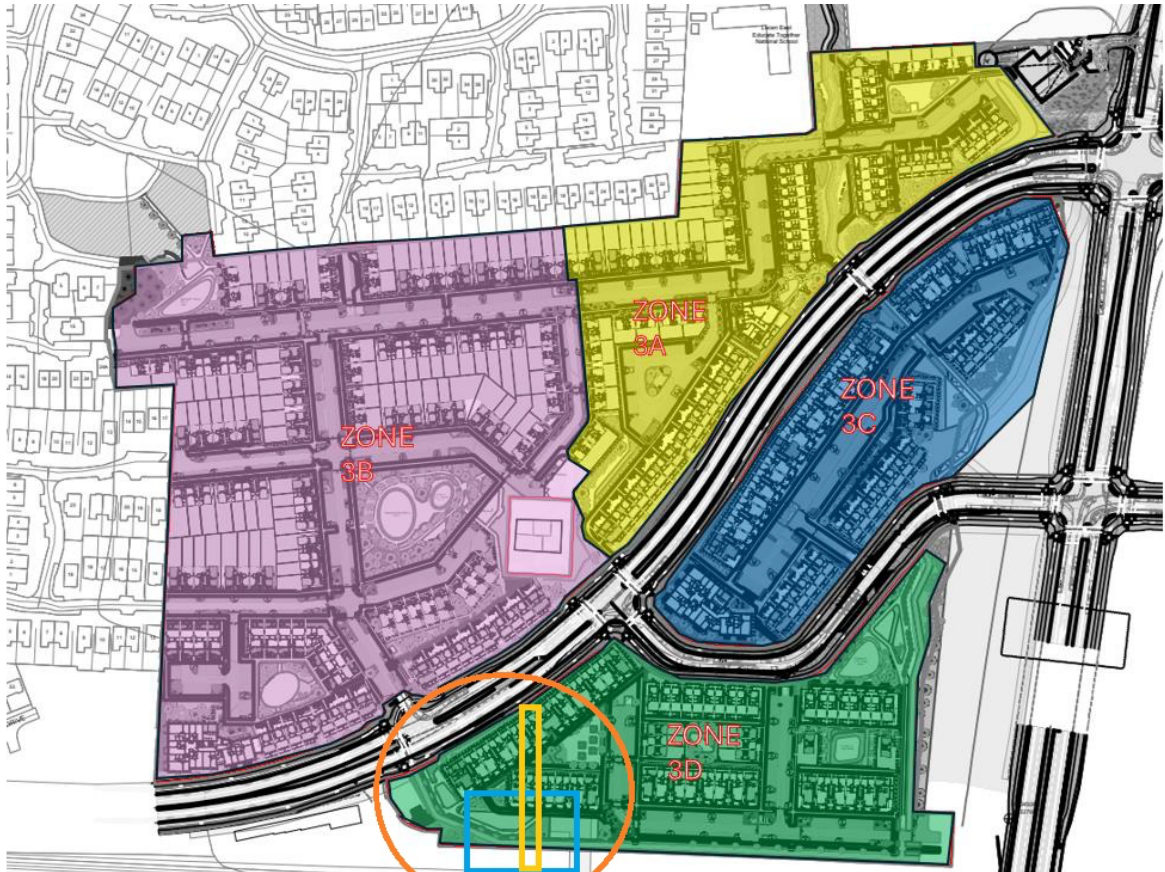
Extract from the submitted Preliminary Construction Environmental Management Plan, prepared by DBFL Consulting Engineers Indicative Phasing Plan with Zone 3D impacted by temporary lands acquisition highlighted.
